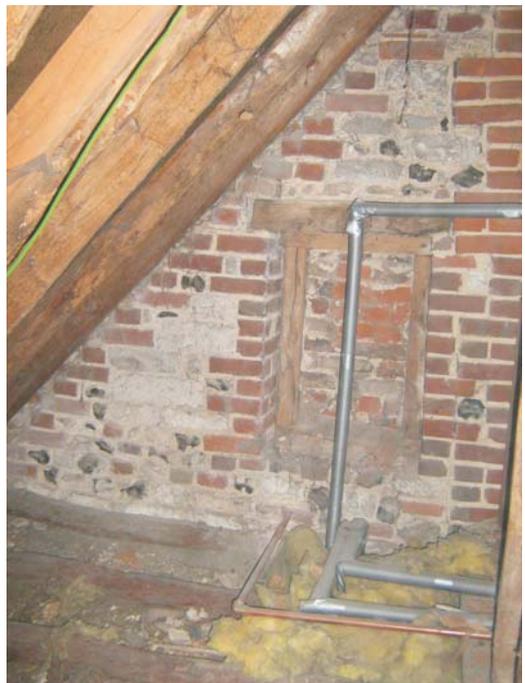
the blocked window in the west wall of the outshot in bedroom 1
